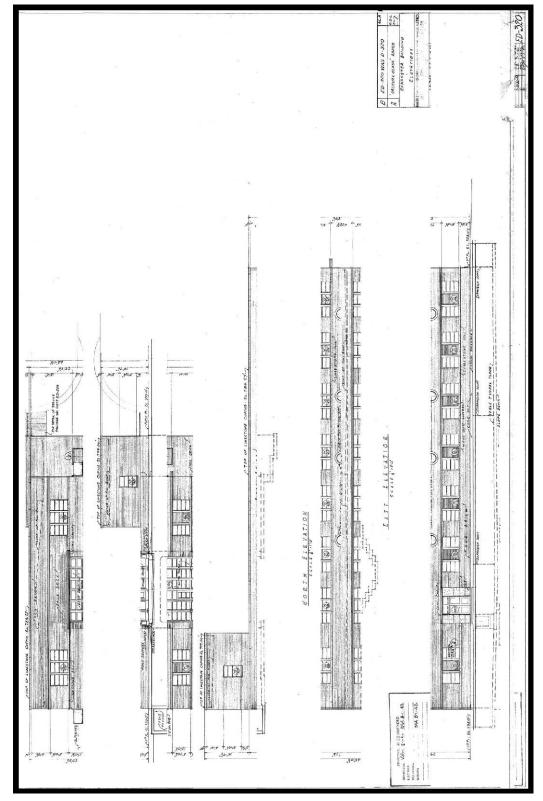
Elevation drawing of the Exhauster Building, 1942 (OH_Cuyahoga_AWT-Support_044).
